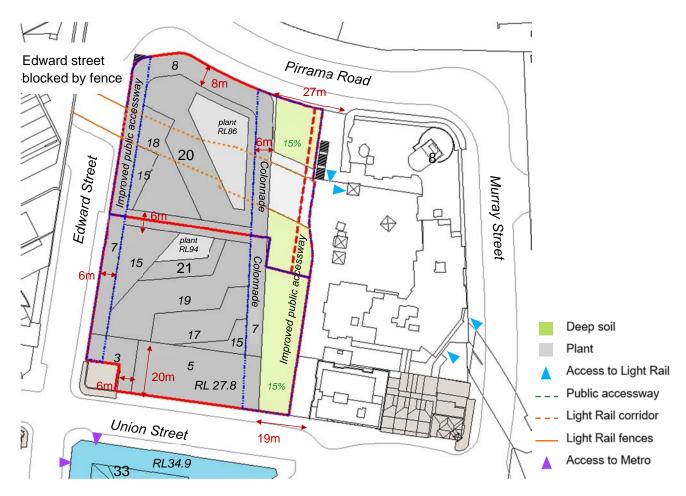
proposed site plan for 2 Edward Street & 60 Union Street
